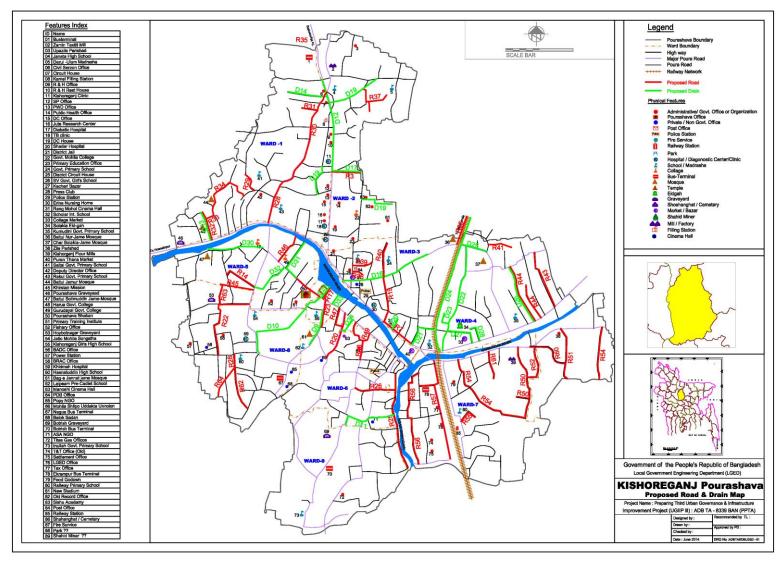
Proposed Drainage Works in Kishoreganj Pourashava
